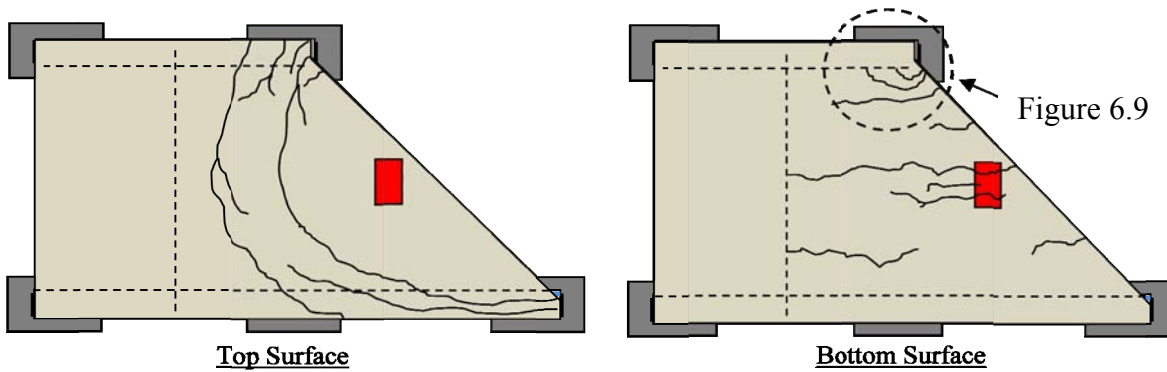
Observed Crack Pattern at Failure of Specimen 6
